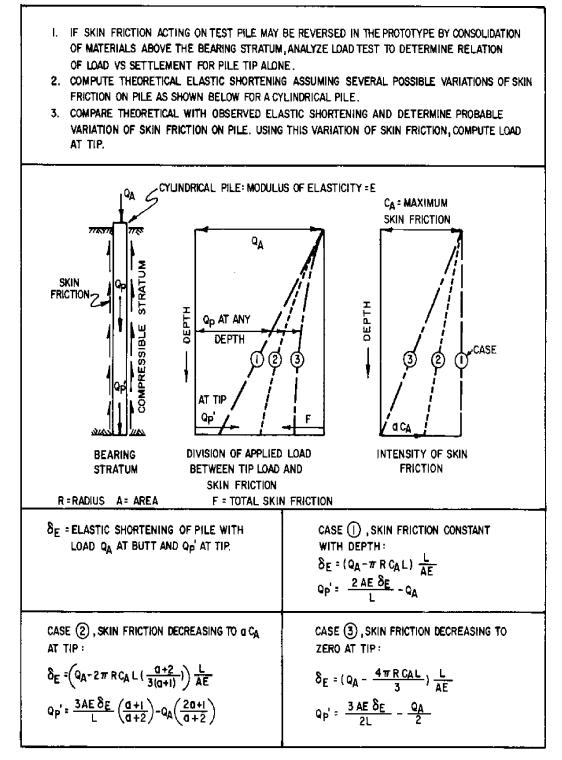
Load Test Analysis Where Downdrag Acts on Pile
